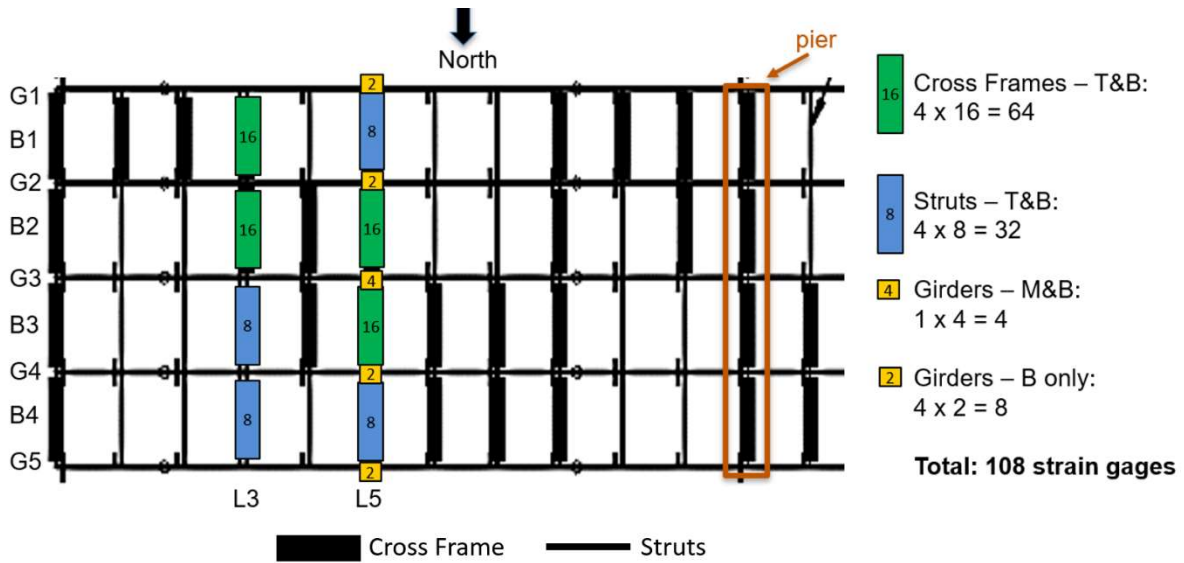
SH 105 Bridge Span 6 Strain Gauge Layout
